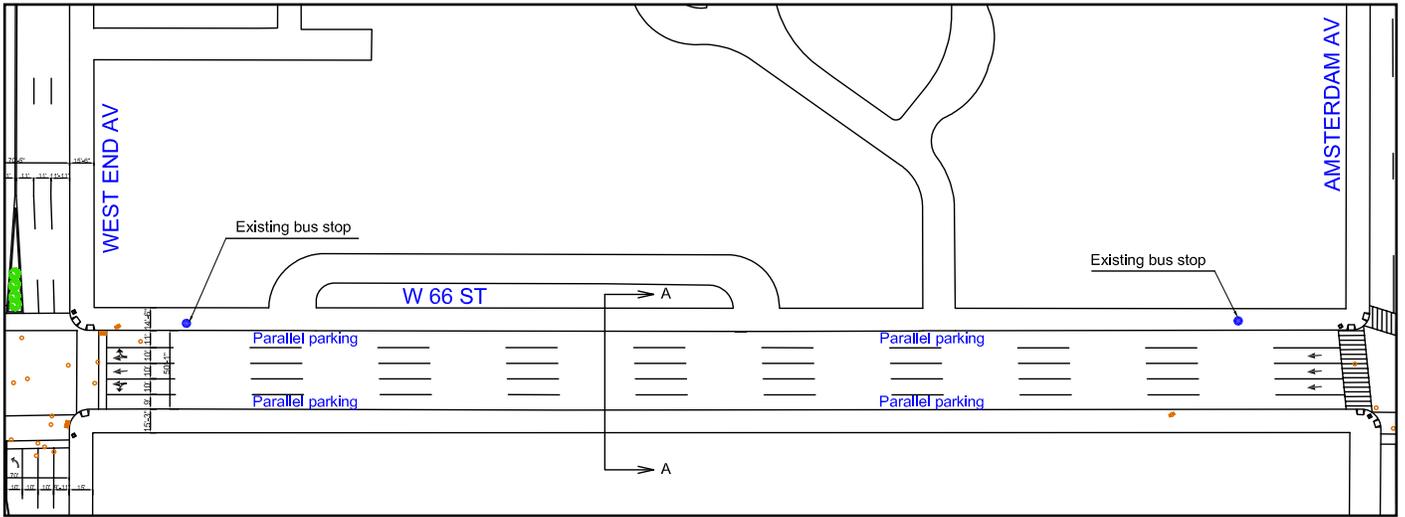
Existing conditions on West 66th Street between Amsterdam Avenue and West End Avenue
